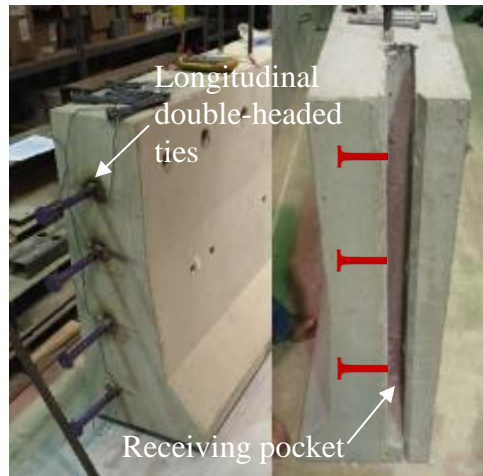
Longitudinal double-headed ties used for barrier-to-barrier connection
